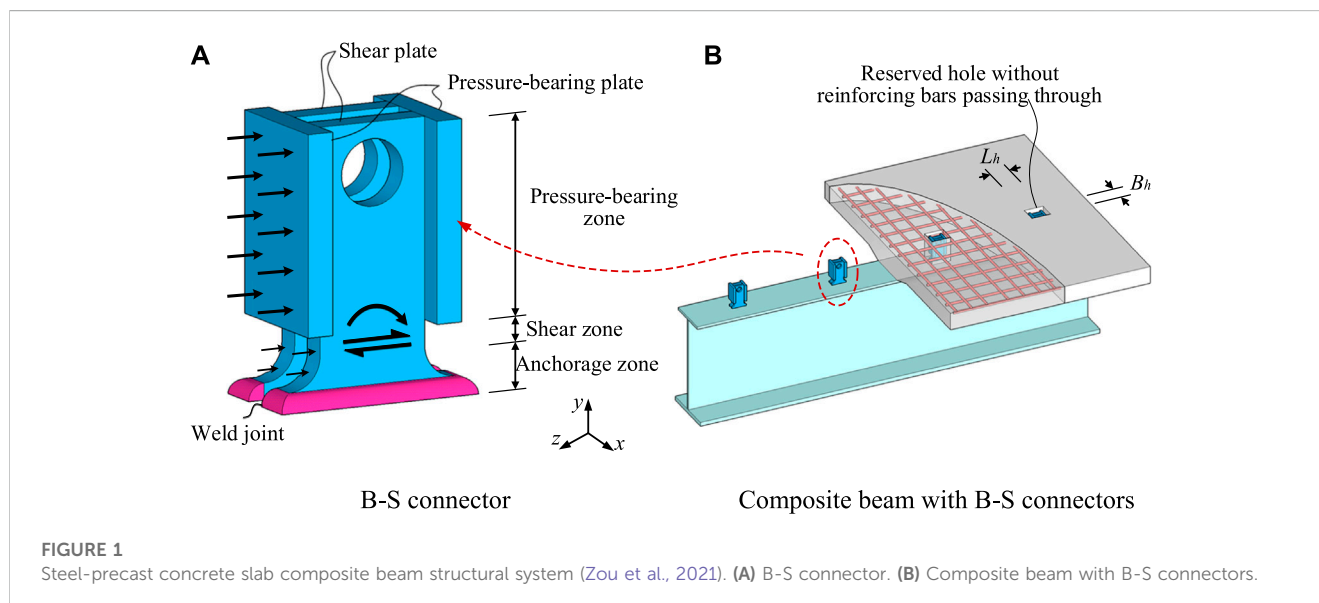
Steel-precast concrete slab composite beam structural system (Zou et al., 2021). (A) B-S connector. (B) Composite beam with B-S connectors.
